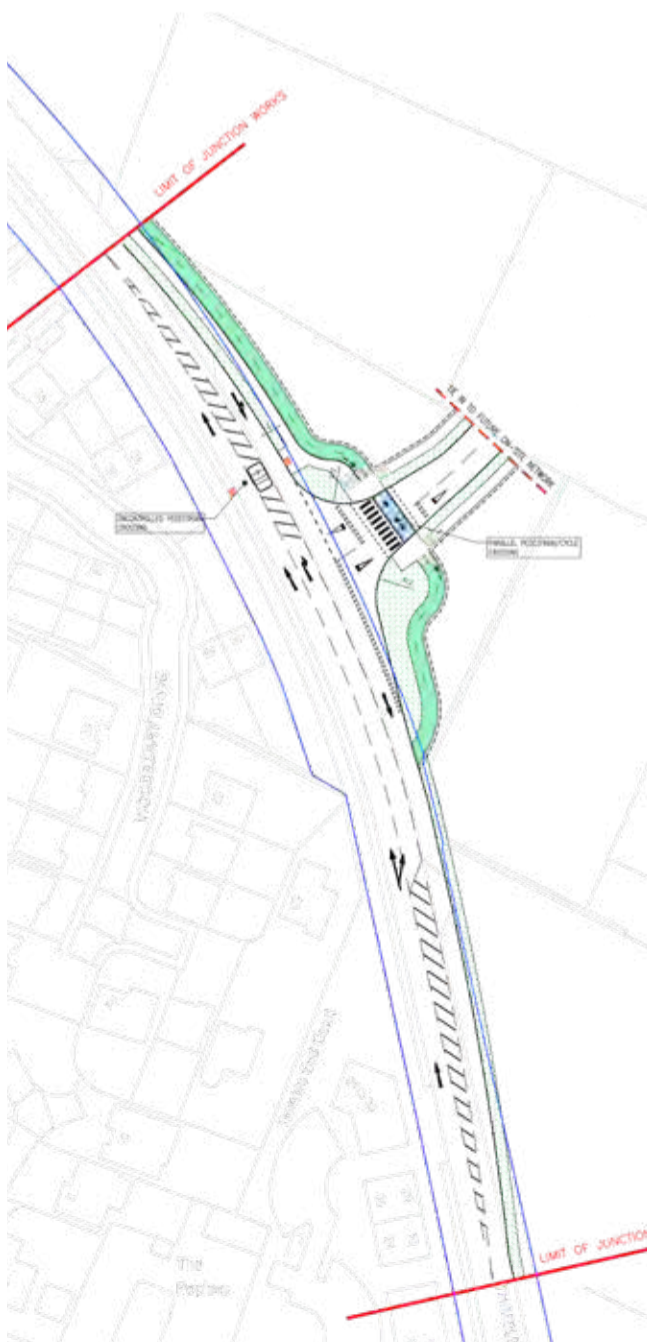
Site Access 6 - Thimble End Road / Primary Site Access
